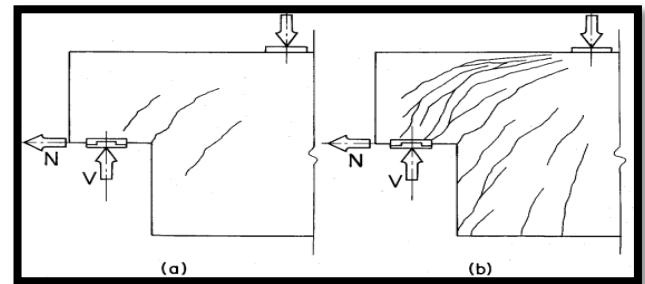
Mattock and Chan (1979) "Typical cracking patterns of dapped-end beams tested: (a) at service load and (b) before fail"
